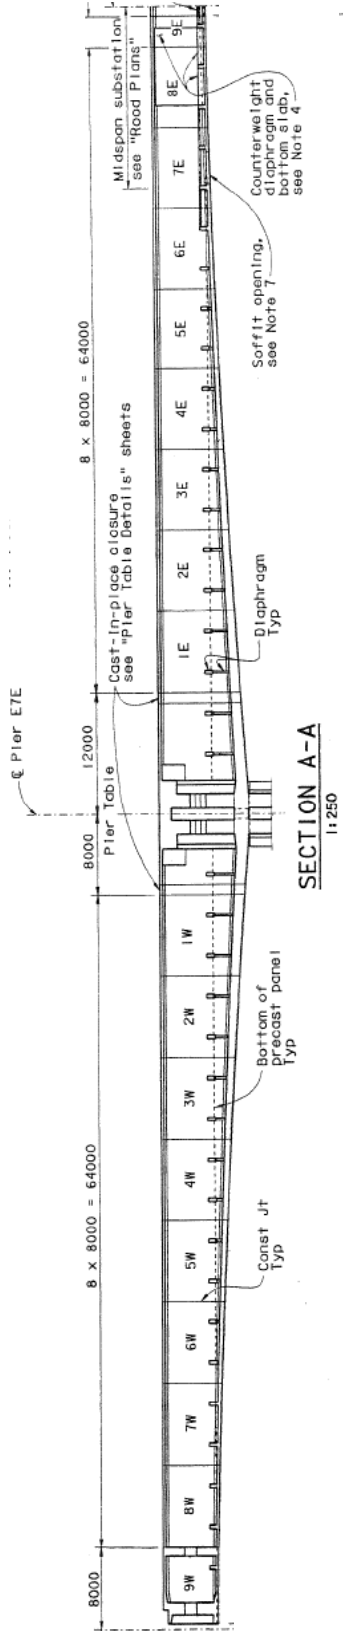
San Francisco Oakland Bay Bridge - Typical Cantilever
